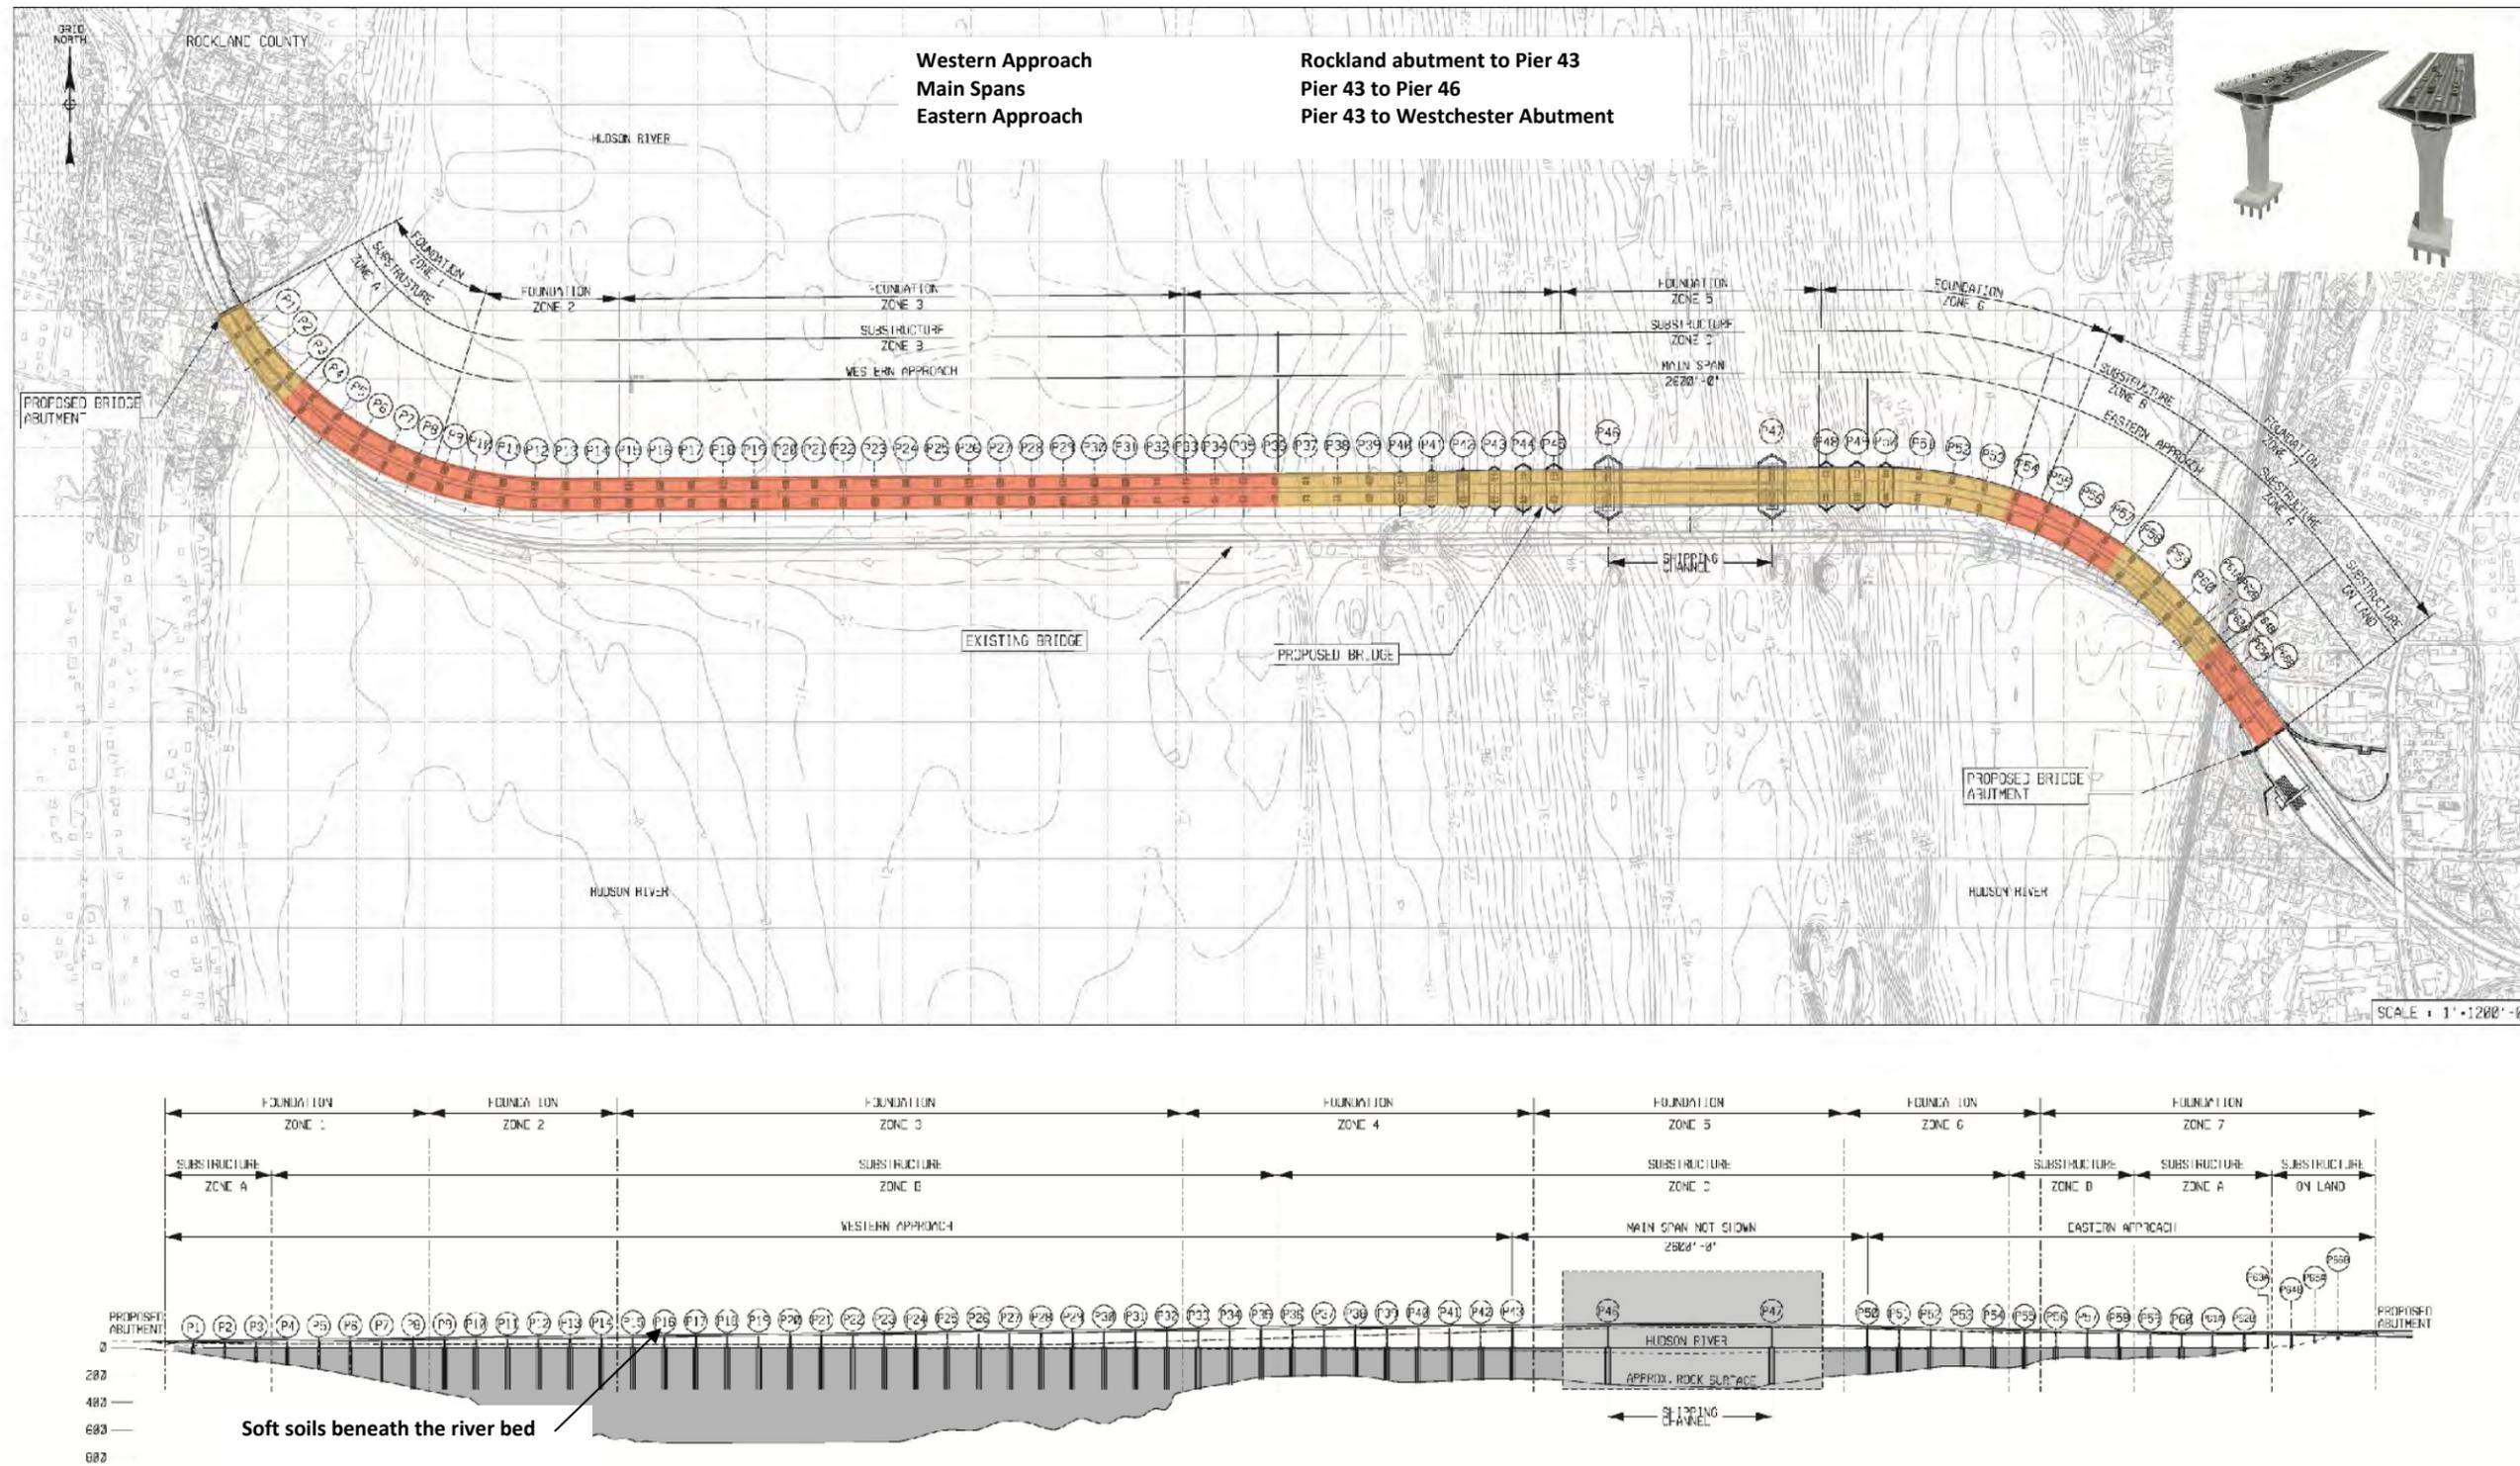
Short Span Bridge Option – Indicative Plan and Elevation
